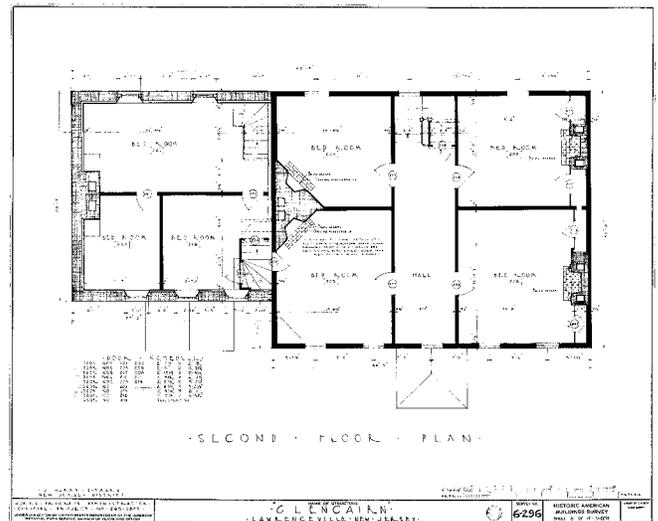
Glencairn Second Floor Plan, 1936—HABS
